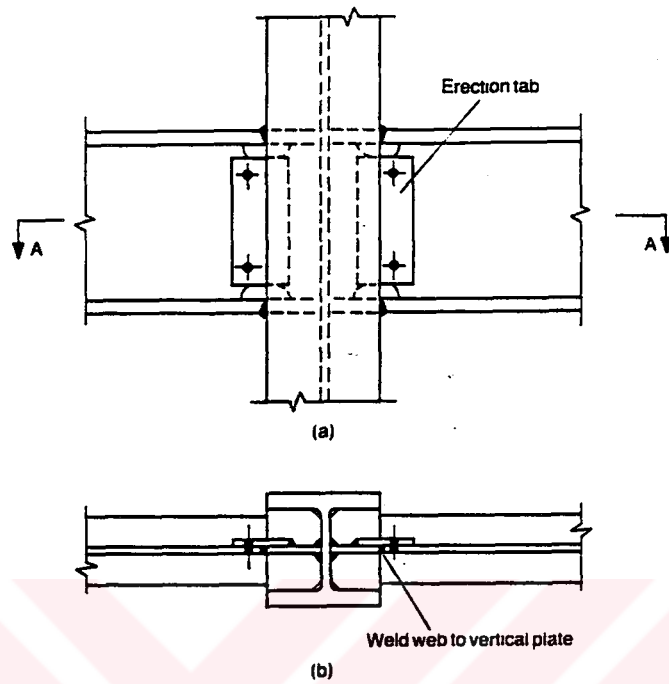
Welded Beam-Column Connection-Weak Axis: (a) Elevation; (b) Plan on A-A
